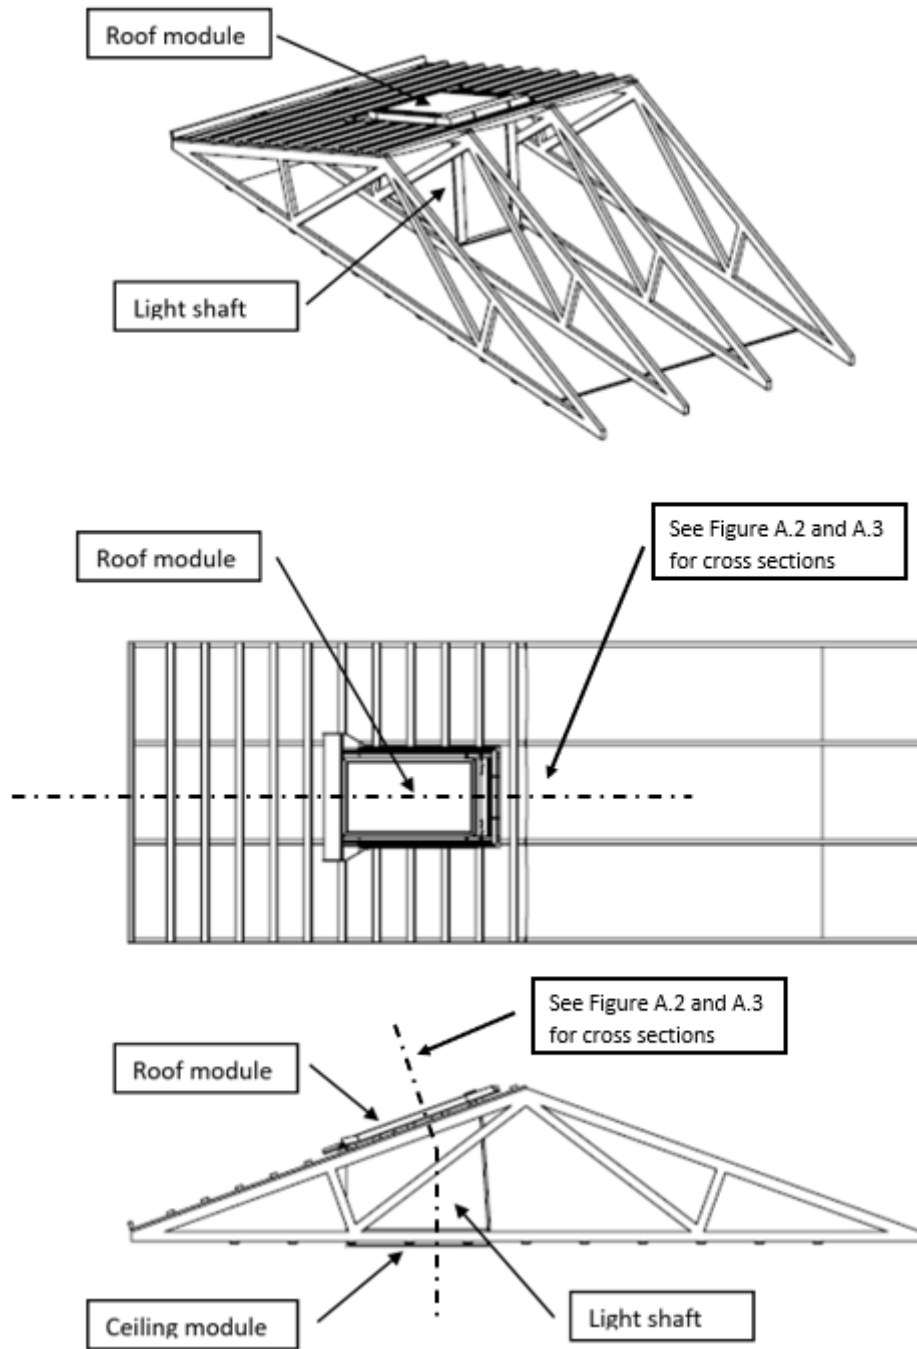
Drawings of assembly principle. (Top) isometric view, (middle) top view, (bottom) cross sectional view
